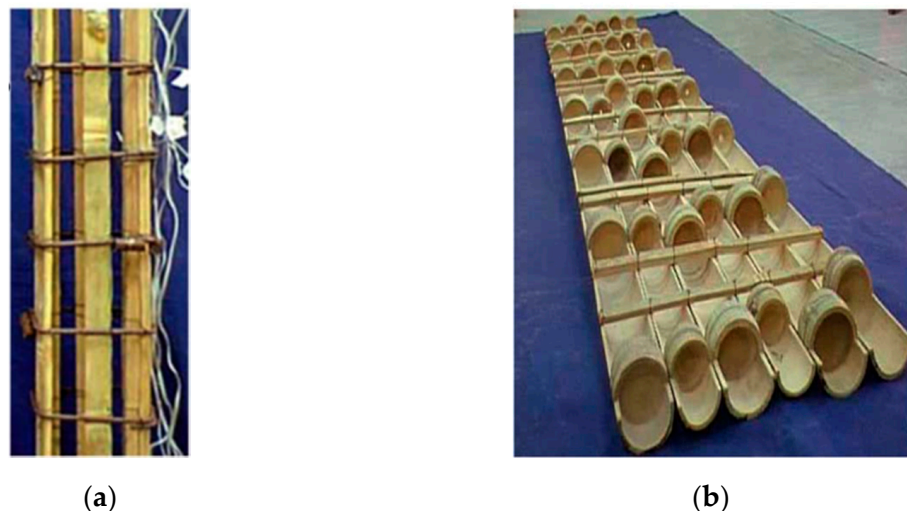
Assembled bamboo reinforcement for (a) concrete column and (b) concrete slab [7].
